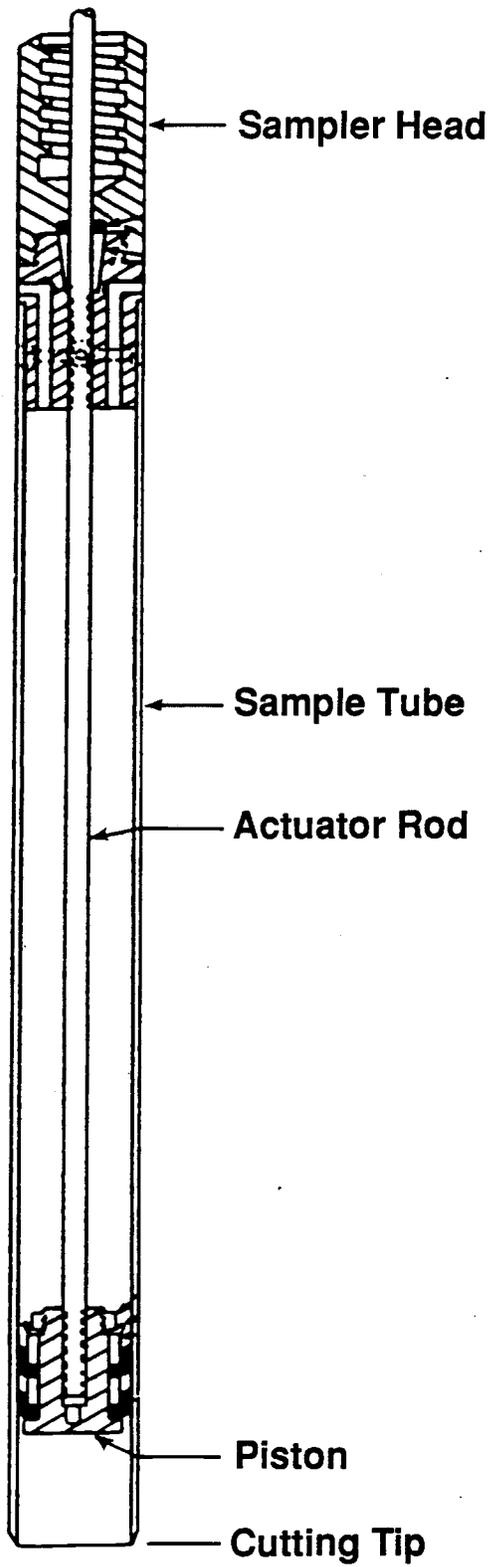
Piston sampler (after Diedrich Drilling Equipment, Inc.)
